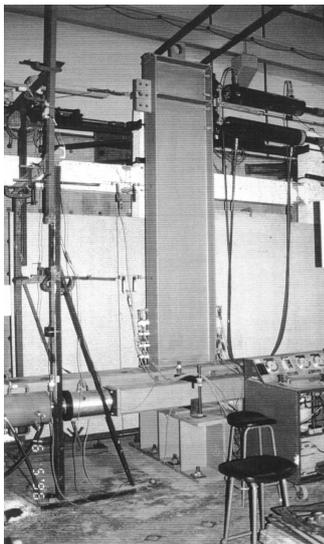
Large-scale, pseudo-static specimen in test rig, prior to loading
